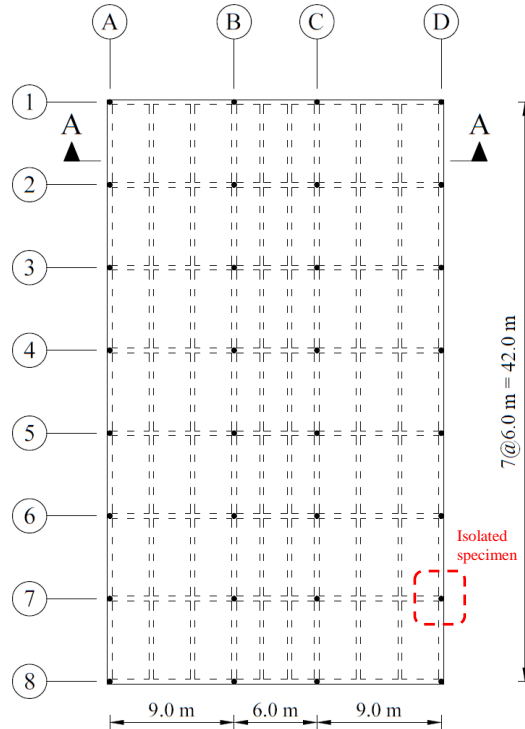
Plan view for the six-story reinforced concrete frame office building
